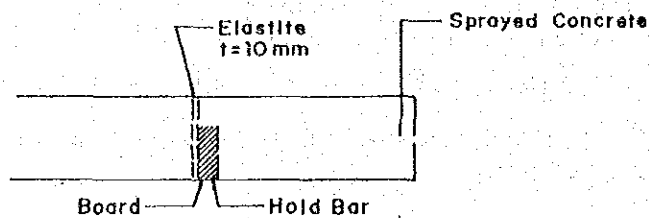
CONSTRUCTION JOINT OF CONCRETE SPRAYING
